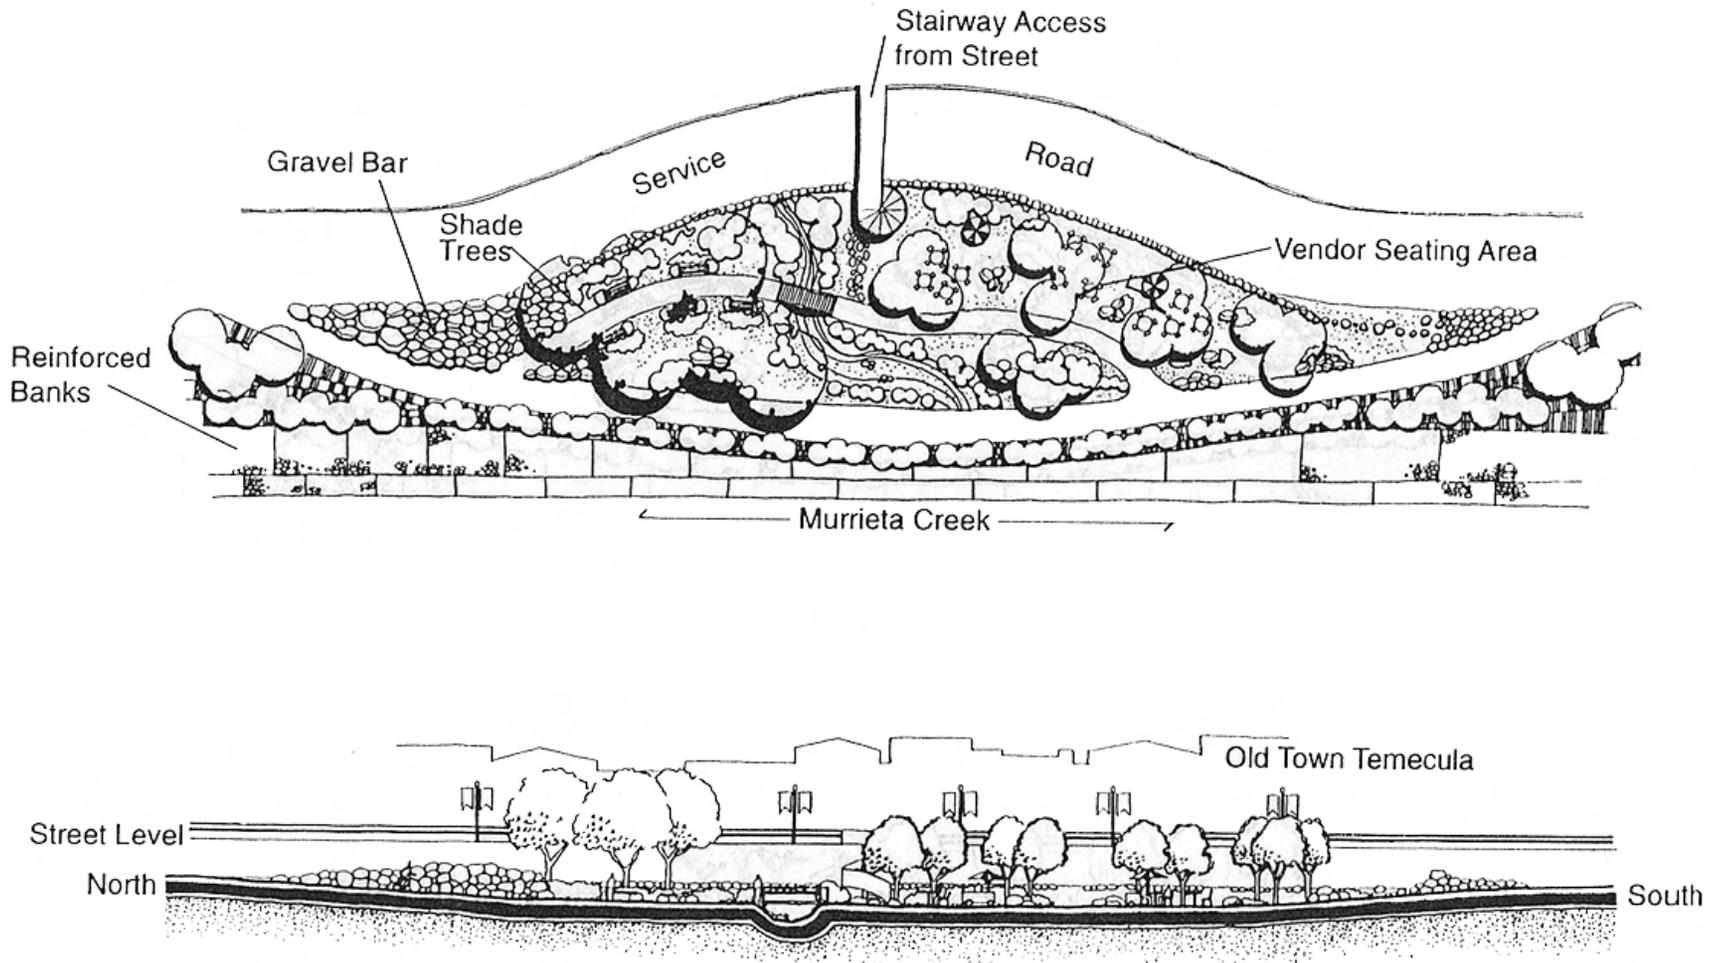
Pocket Park Plan and Section (*Integrated Management Plan for Murrieta Creek, 1992*)
